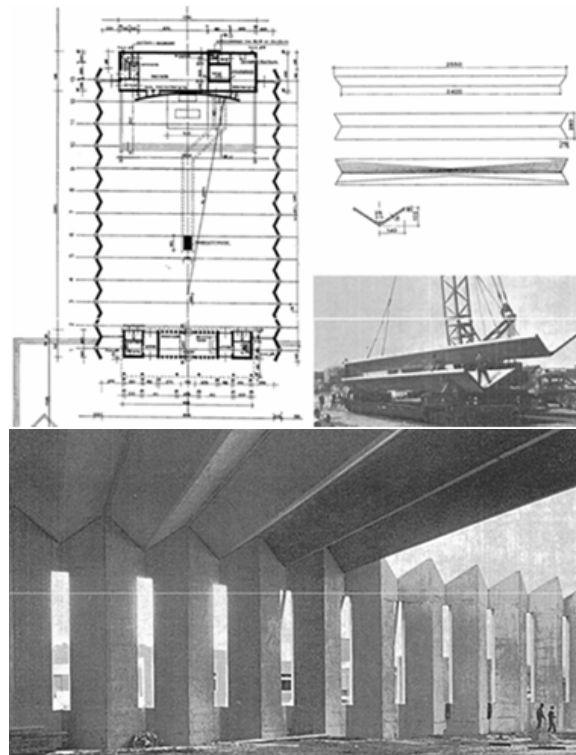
The Church in Hoensbroek [7]. (a) (top left): Plan, (b) (top right): Precast folded plate components, (c) (bottom): The building under construction.
